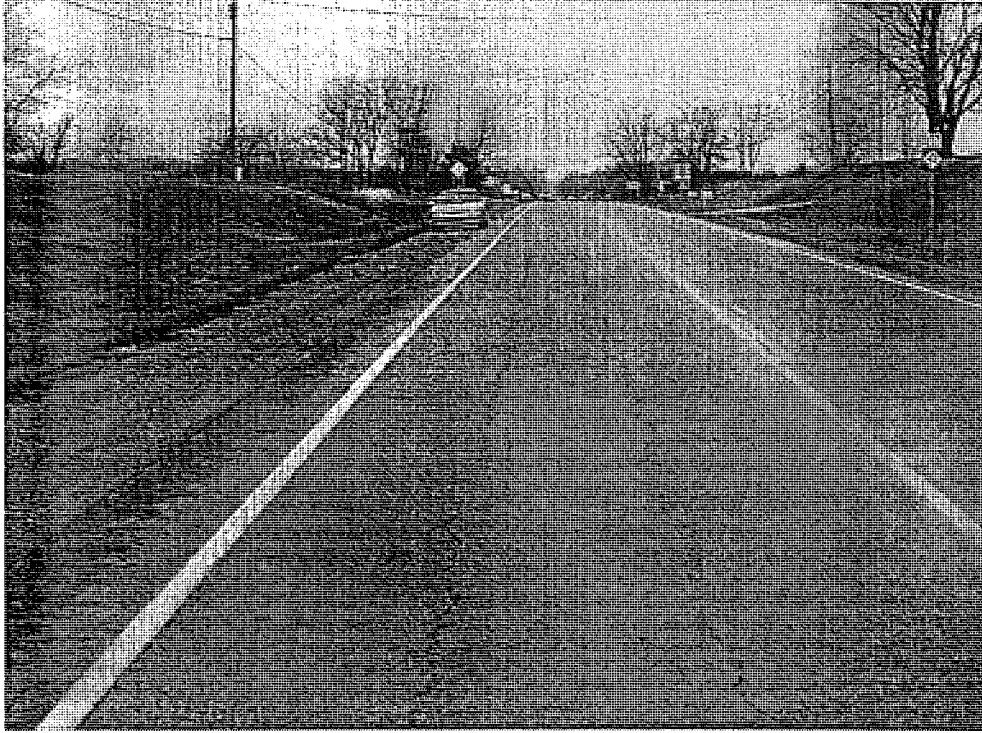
M-15 SB section 1 test site 1 north of Otisville village
